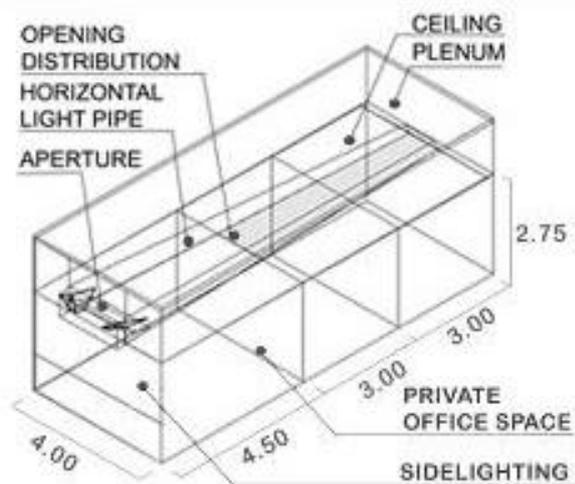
Perspective of a single horizontal light pipe in private office spaces
